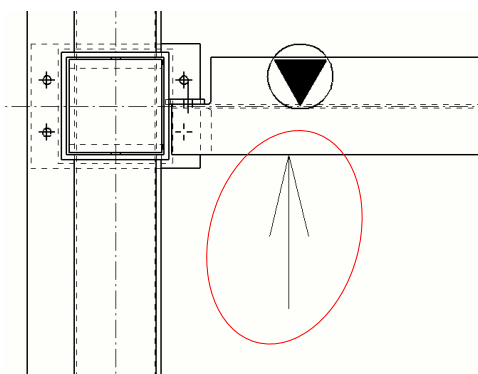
An open arrow indicating from which direction the beam is to be installed.
